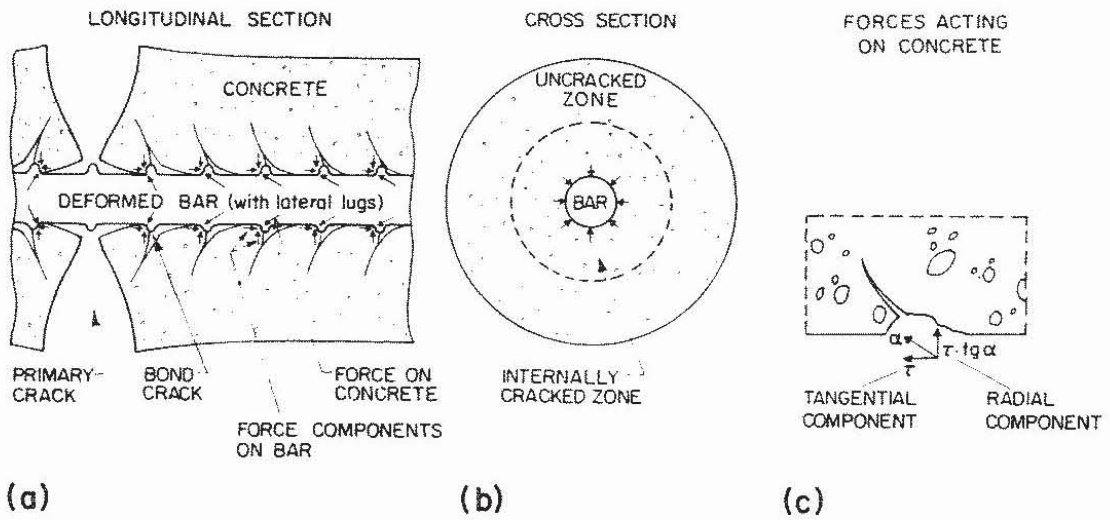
INTERNAL BOND CRACKS AND FORCES ACTING ON CONCRETE (AFTER [14])
